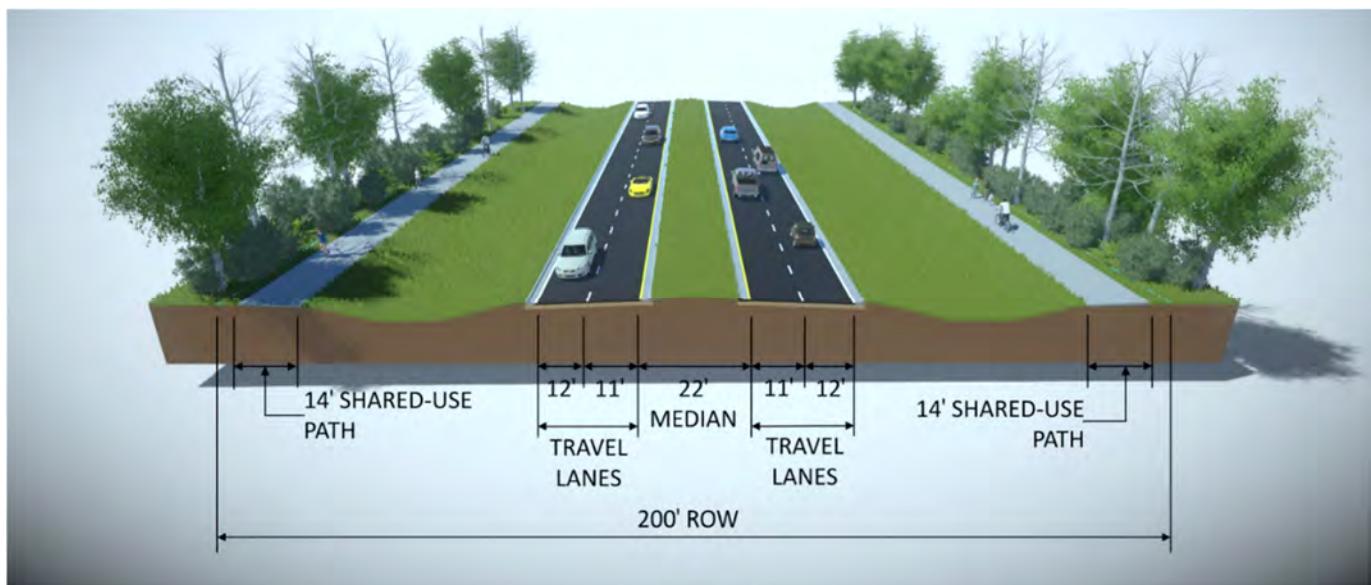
Segment 2 Typical Section (Friday Road (North)) to Cox Road
